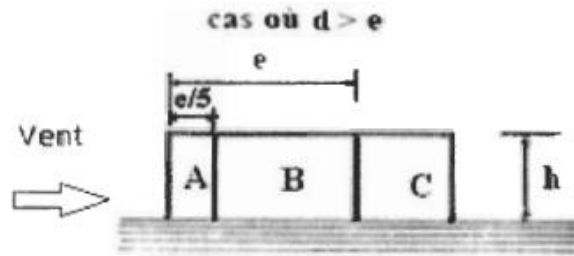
Elevation view of the pressure zones on the vertical walls direction V1
